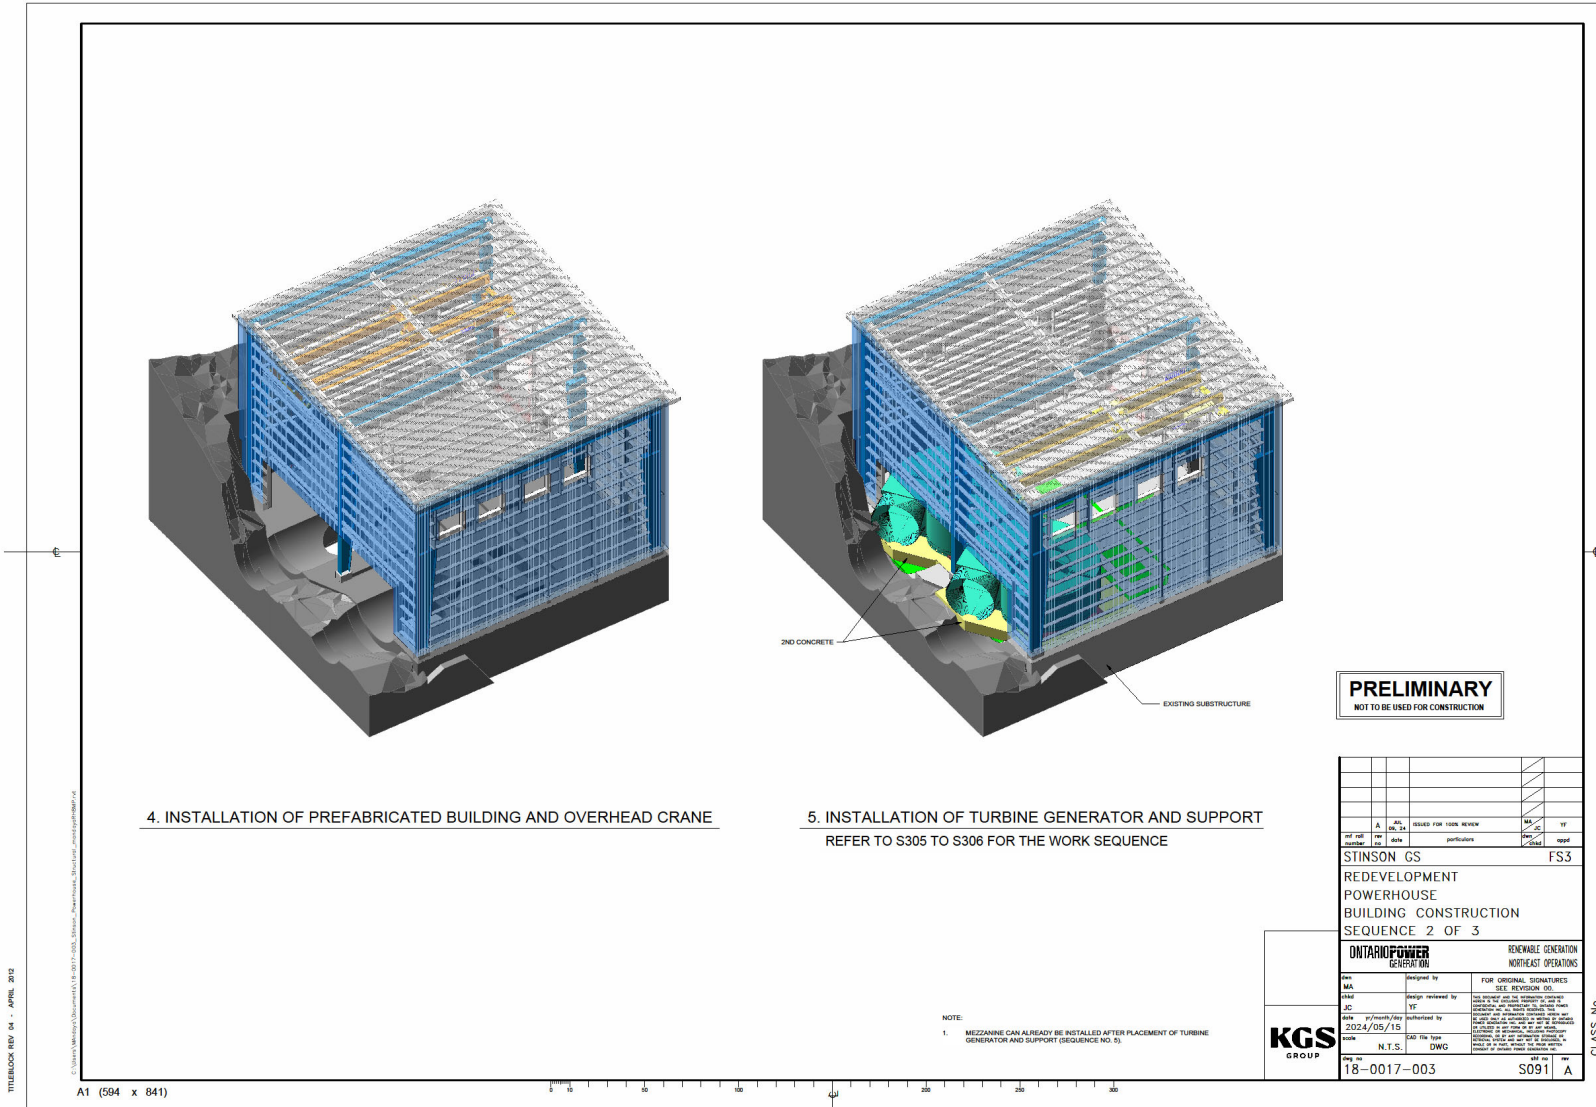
Powerhouse Construction – Installation of Prefabricated Building, Overhead Crane and Turbine Generator and Support
